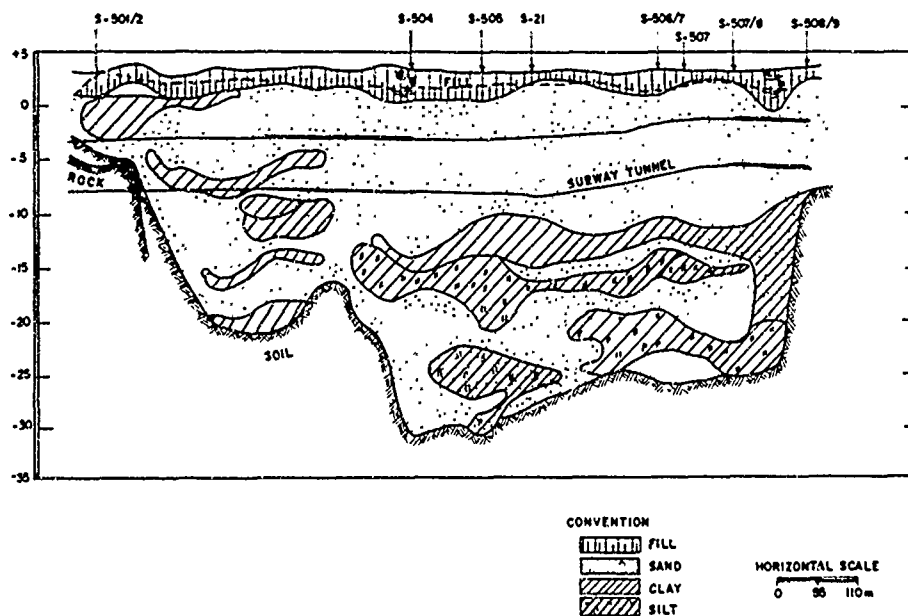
Rio de Janeiro Subway Cross-Section at Catete Street
